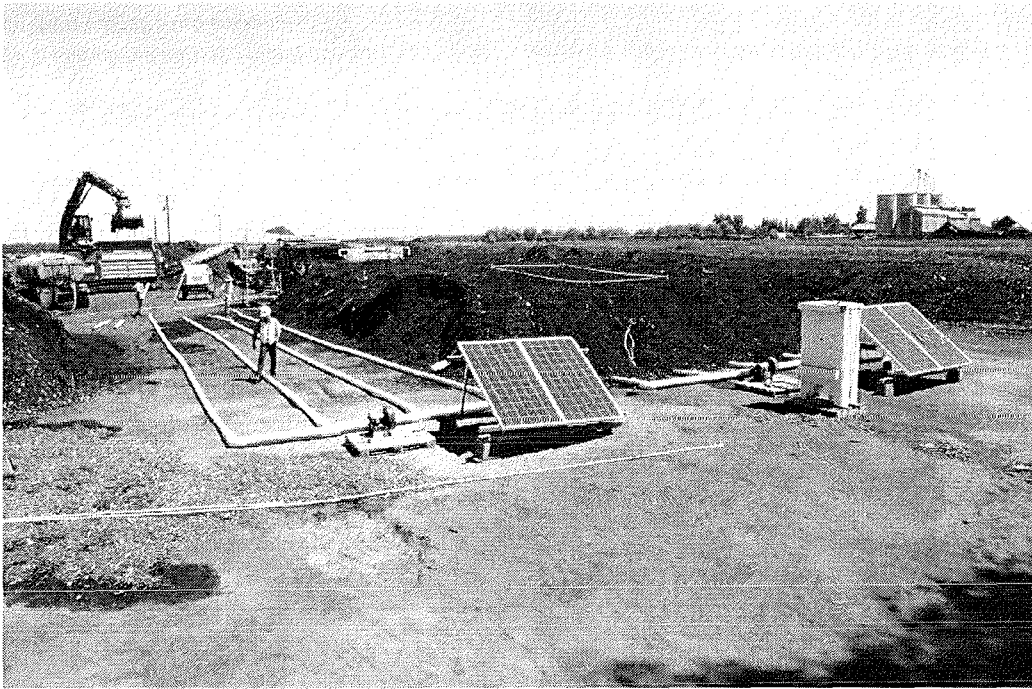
View of project with completed eASP zone 1 on right, and aeration pipes in place for Zone 2. Zone 1 photovoltaic system is complete; panels are in place for Zone 2.
